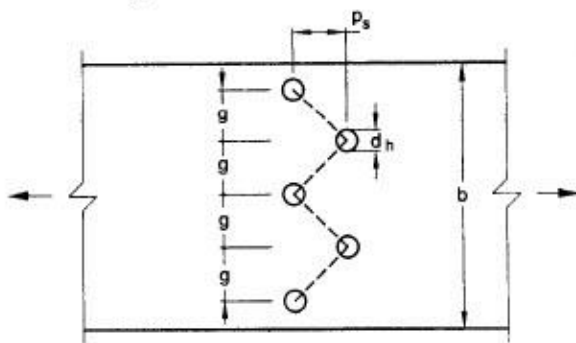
PLATES WITH BOLTS HOLES IN TENSION
